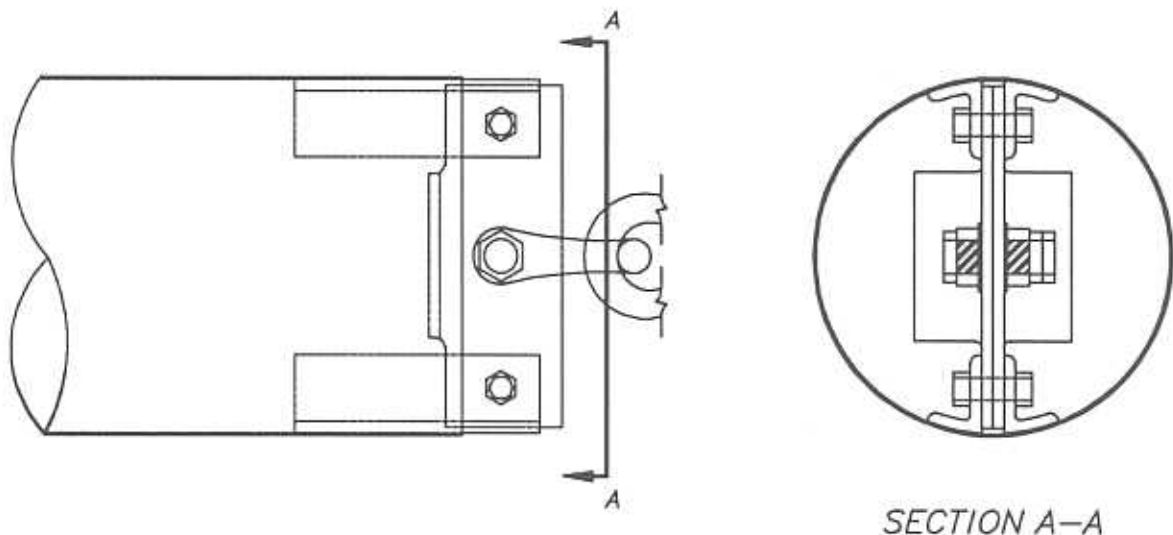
Connection details for steel pipe debris booms used by PG&E.
